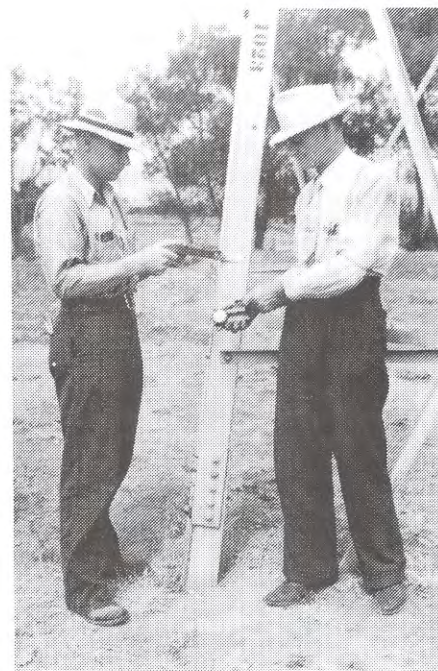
Wood bracket and magnetic links for measuring maximum crest lightning stroke current and direction of flow in tower members and buried counterpoise conduction on Shoshone-Denver line.
